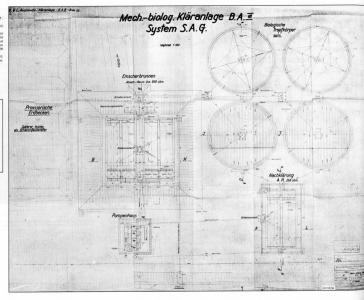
, drawn by prisoner 72231 on 16/12/43, checked by Janisch on 22/12/43 and approved by Jothann.
